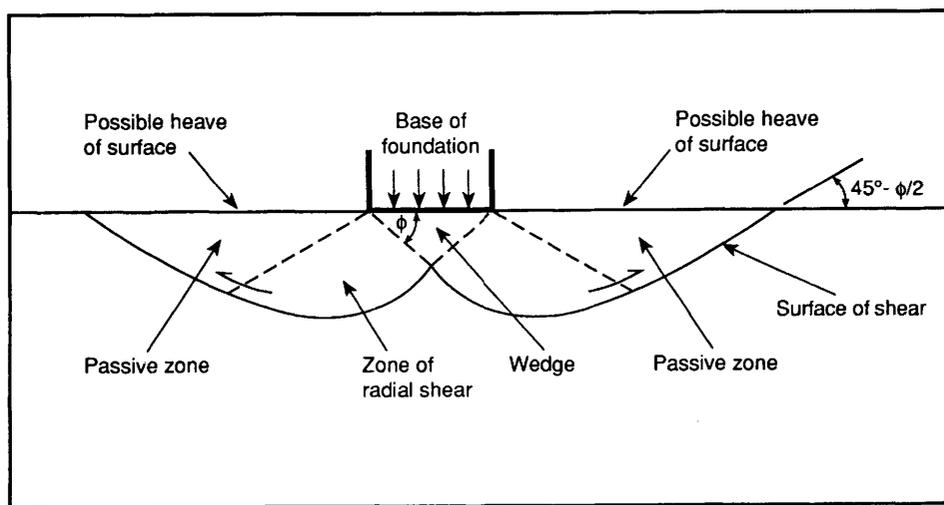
Typical bearing capacity failure of the soil supporting a foundation.
